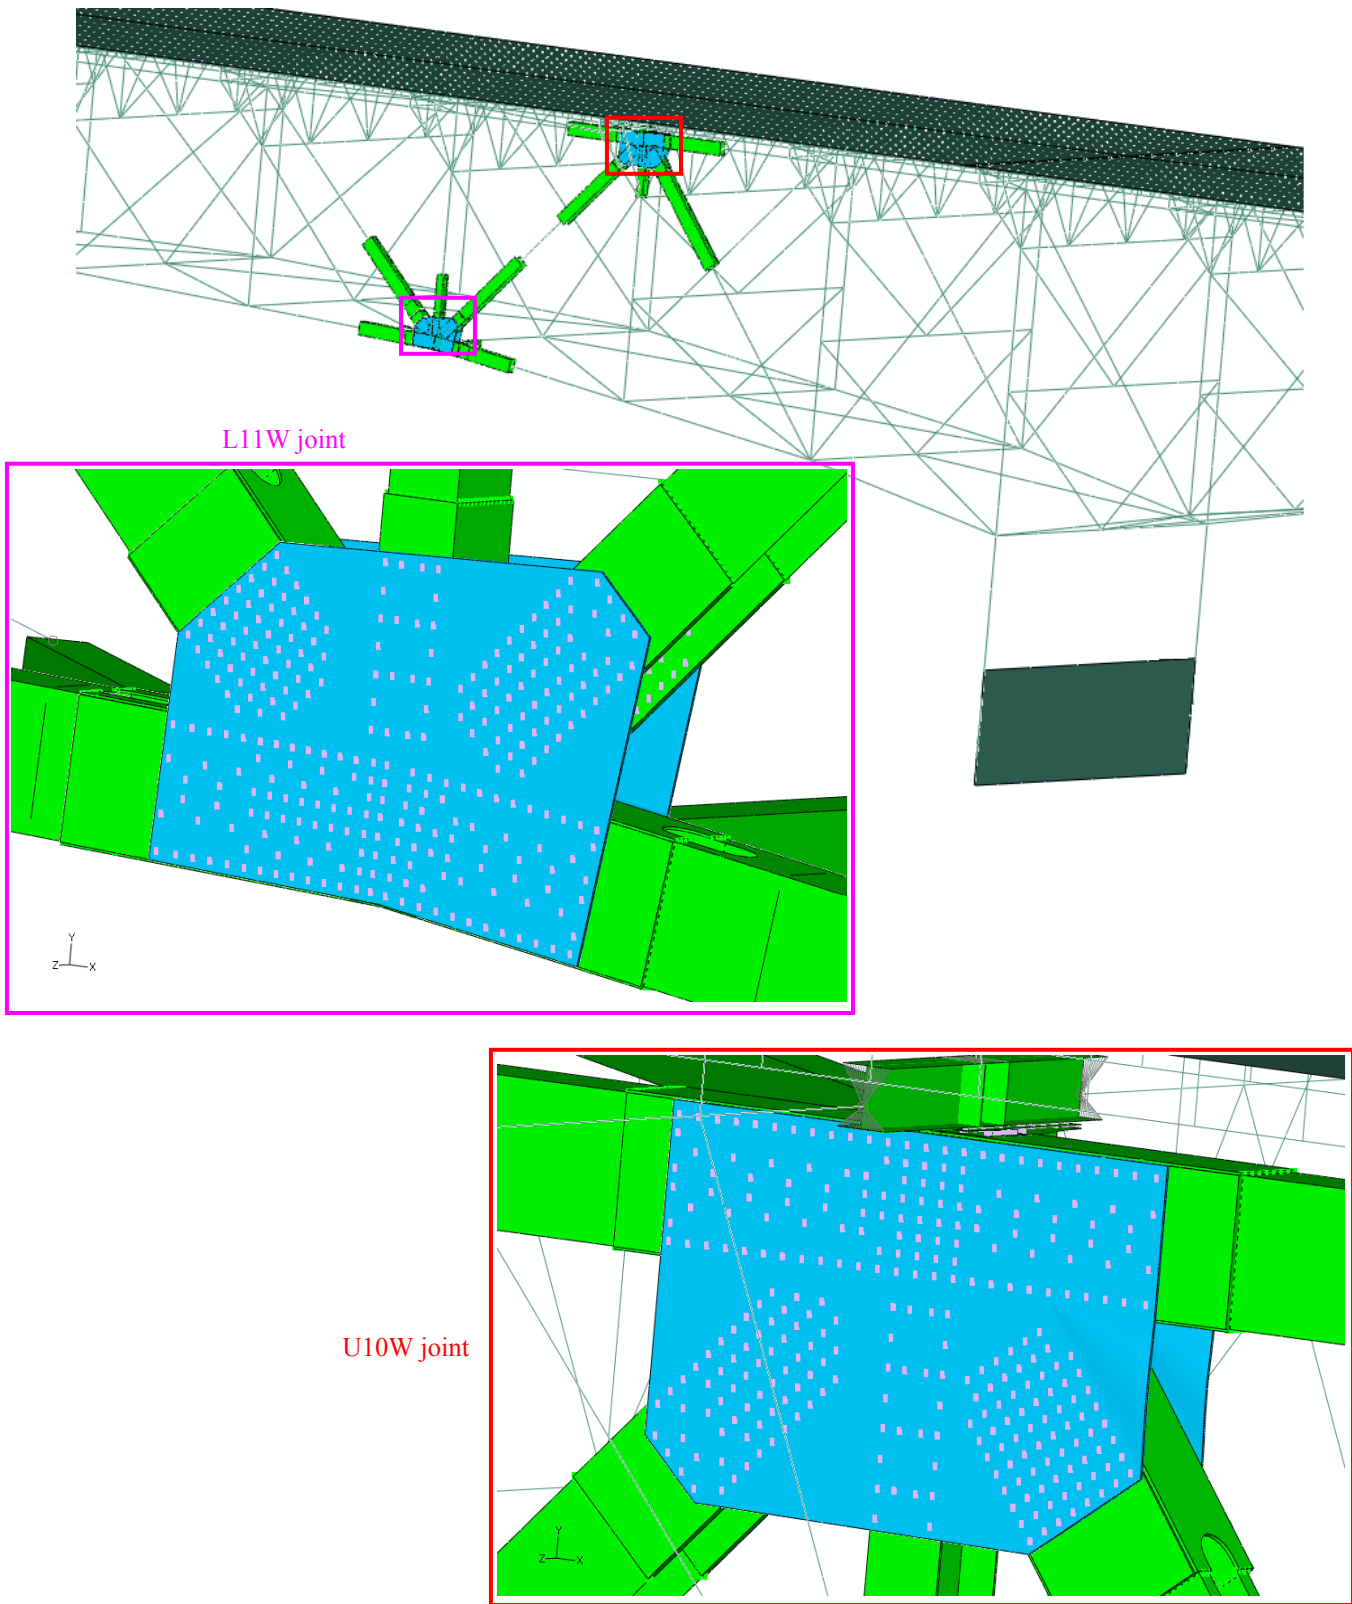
The L11W and U10W joints embedded in the FHWA structural element bridge model
